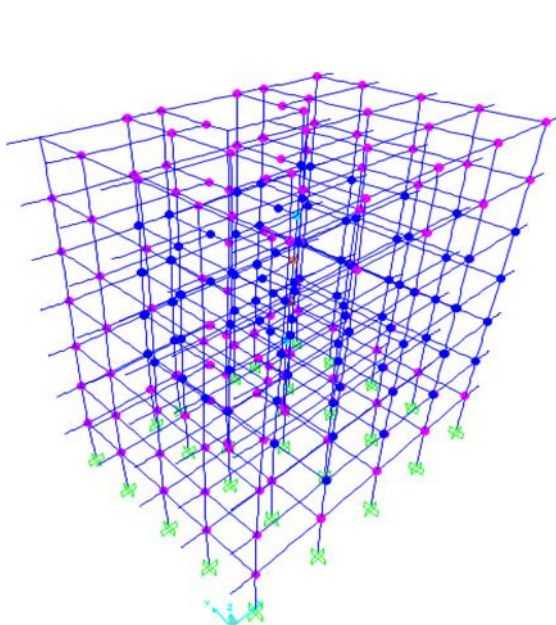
Design of fibre reinforced concrete building-2 shape in x-direction for resisting earthquakes
